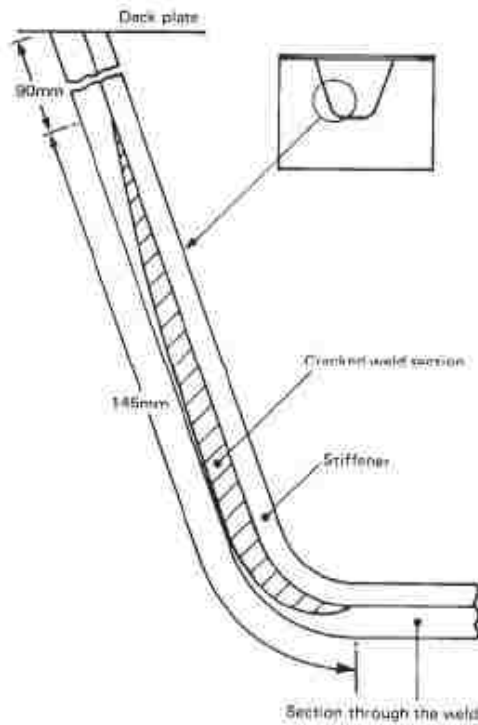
Weld throat failure in rib-to-floor beam connection with ribs fitted between floor beams (reproduced from Kolstein 2007)
